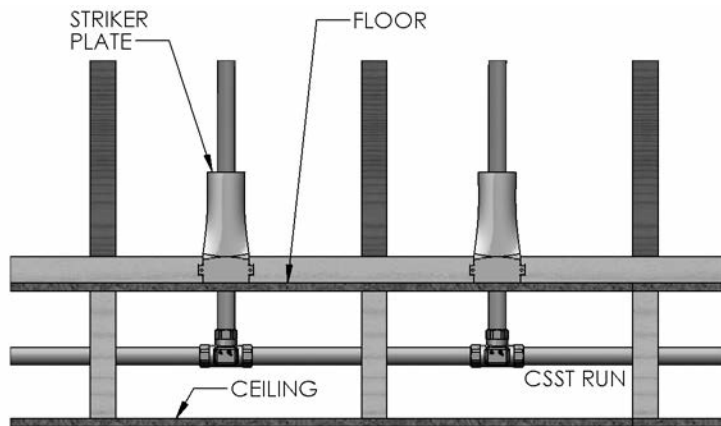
Multiple gas outlets connected to the same run of WARDFLEX®/ WARDFLEX® II. In this situation a tee-type fitting can be used and installed in a concealed location.
